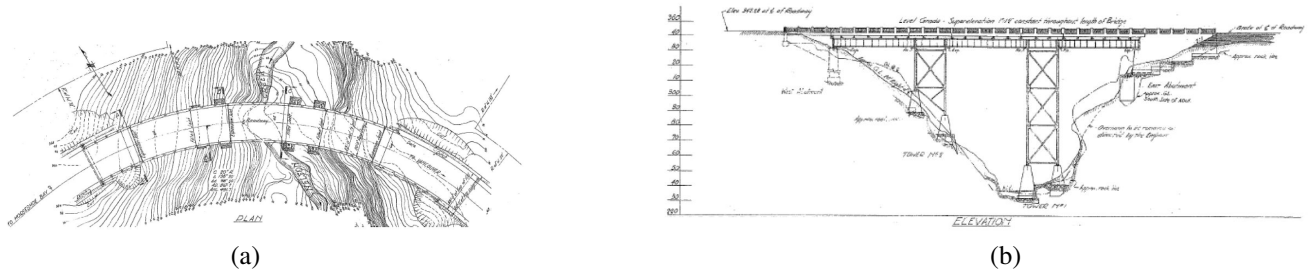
Plan and elevation view of the bridge: a) Plan view; b) Elevation view
